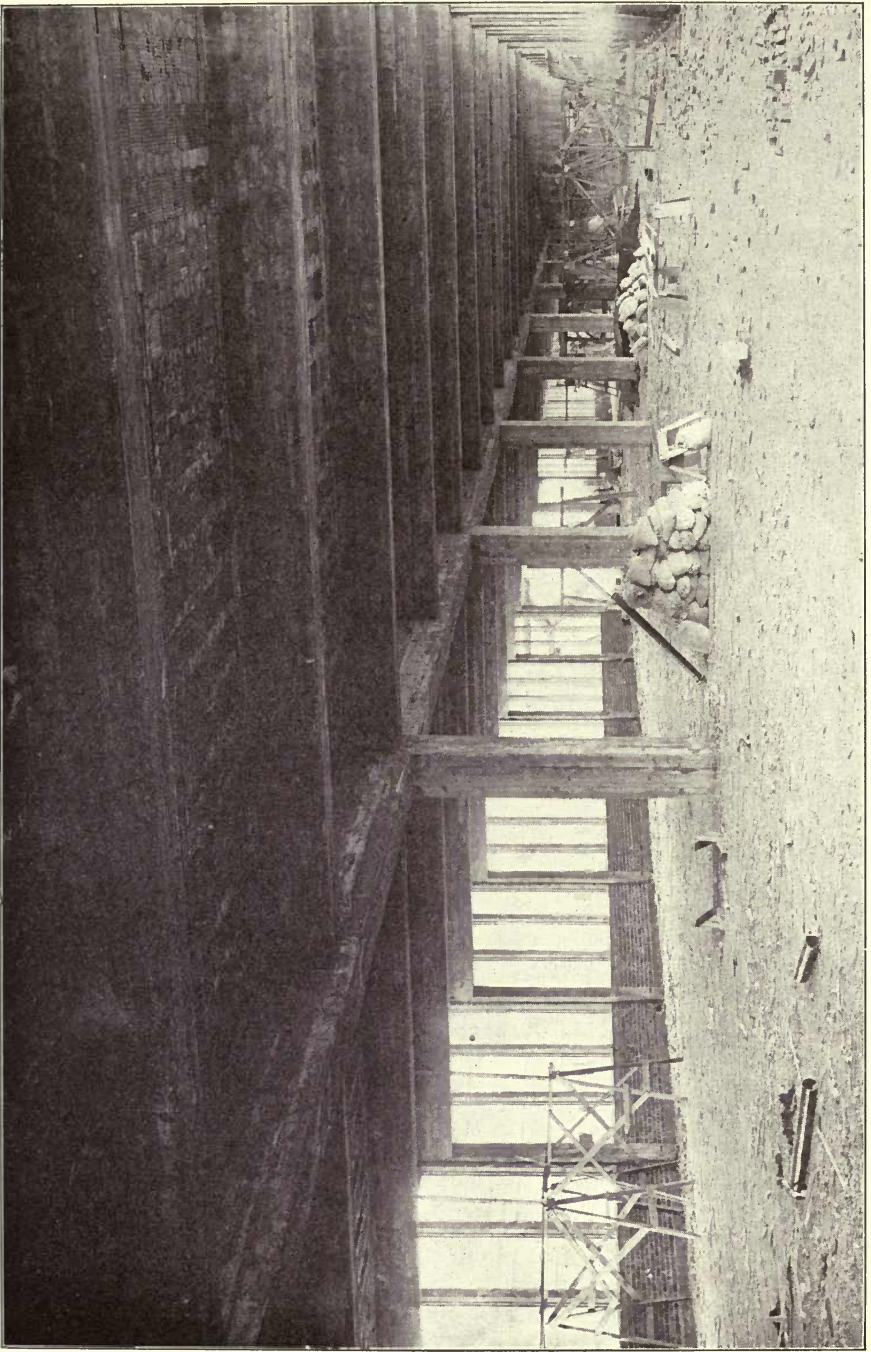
Interior View of Packard Factory Under Construction. (See p. 138.)
